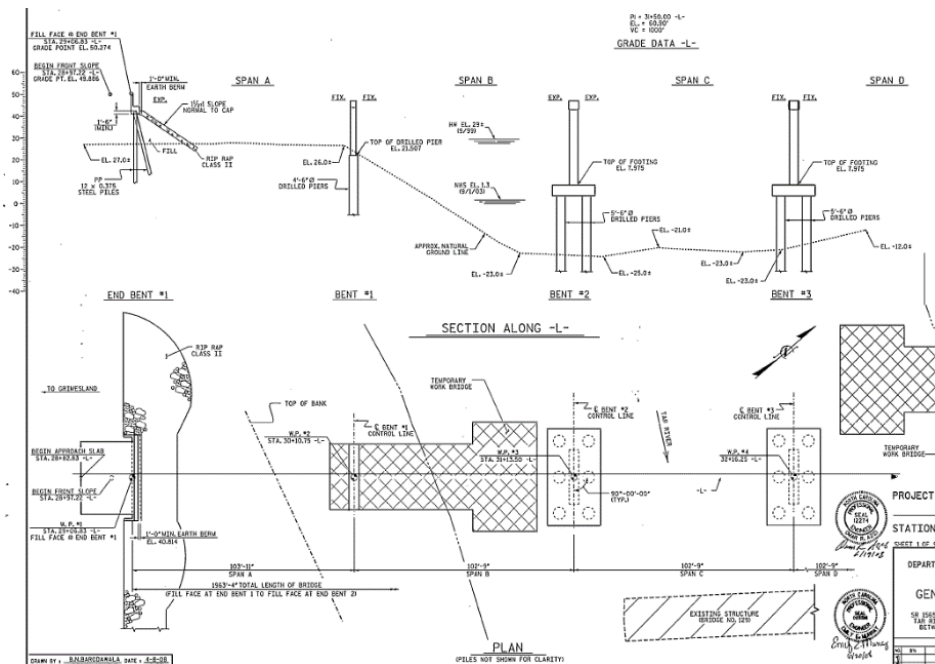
Longitudinal Section of the Bridge from Span A to Span D
